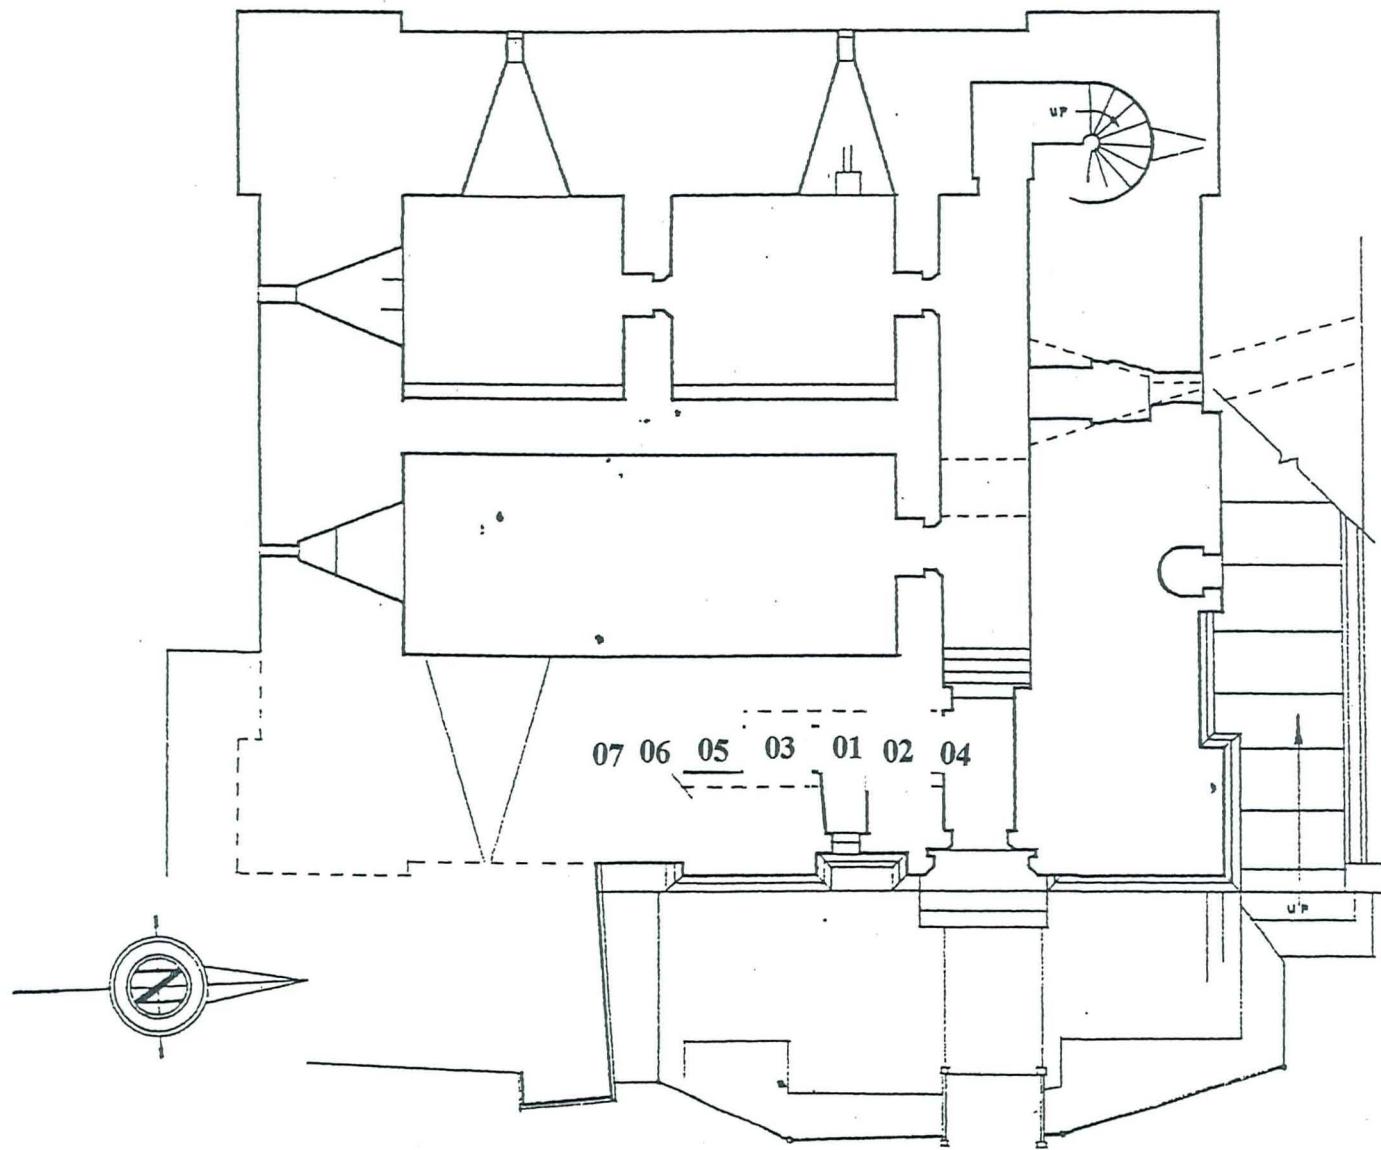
The Keep to show approximate position of samples from the stair ceiling boards
